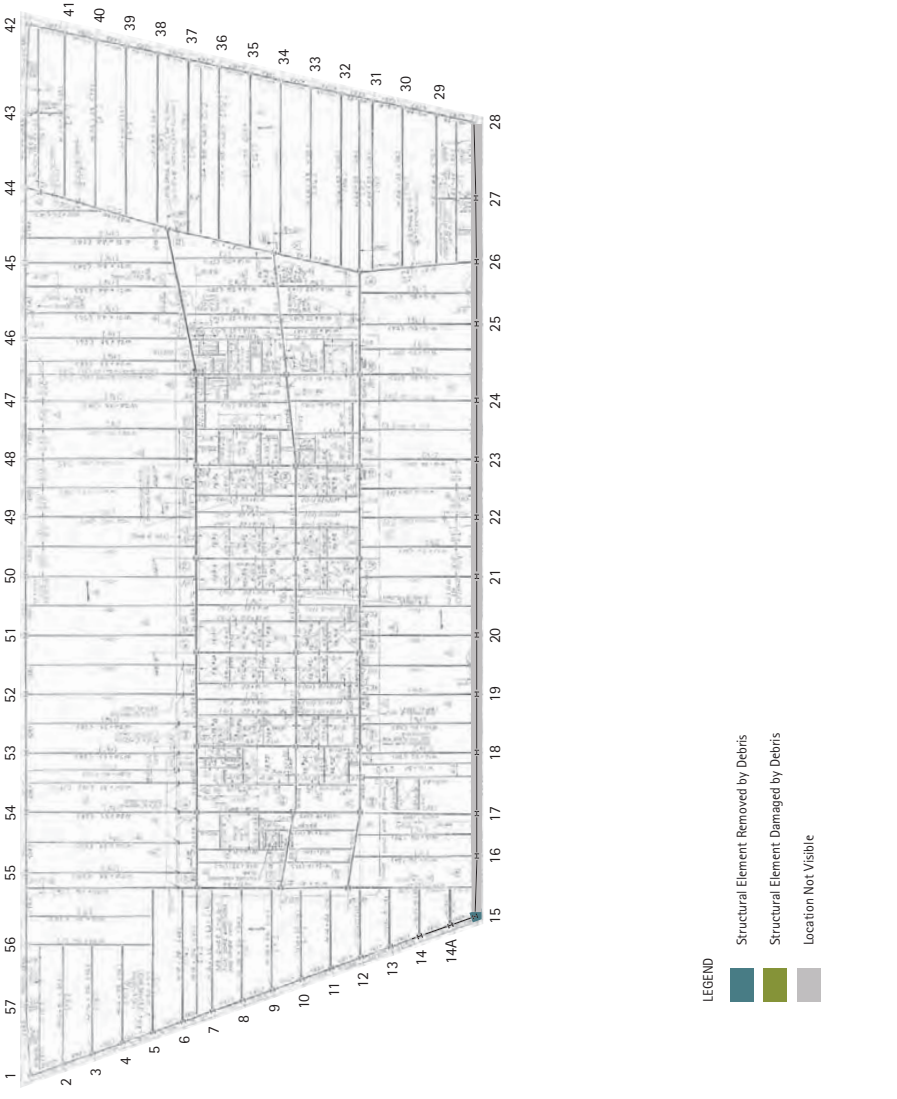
S.01 WTC7 South facade - Debris Damage after WTC1 collapse
